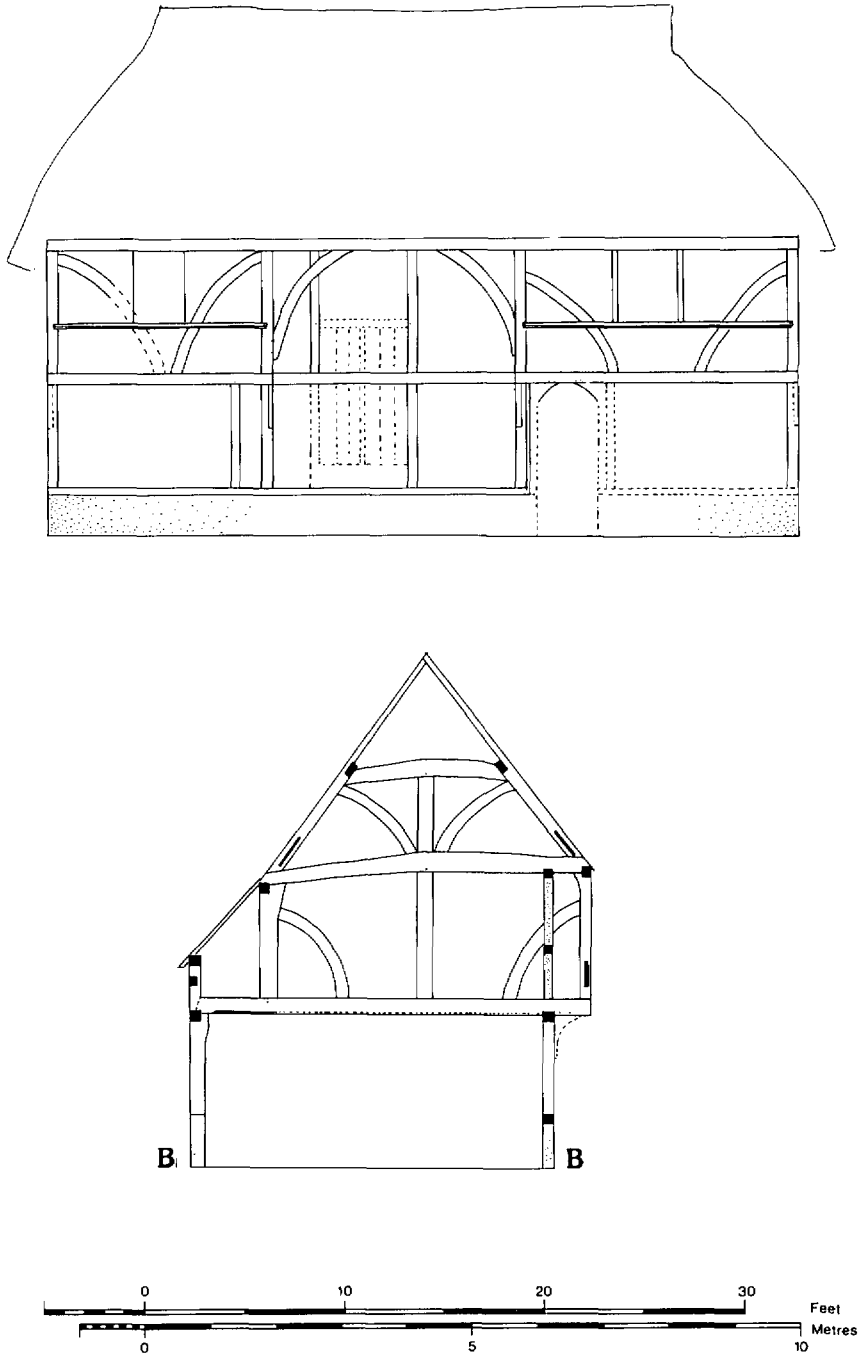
Elevation and cross section of the Red Lion, Chalton.
